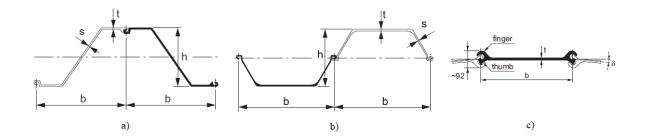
Standard sheet pile profiles a) Z-profile b) U-profile c) Straight web profile [3]
